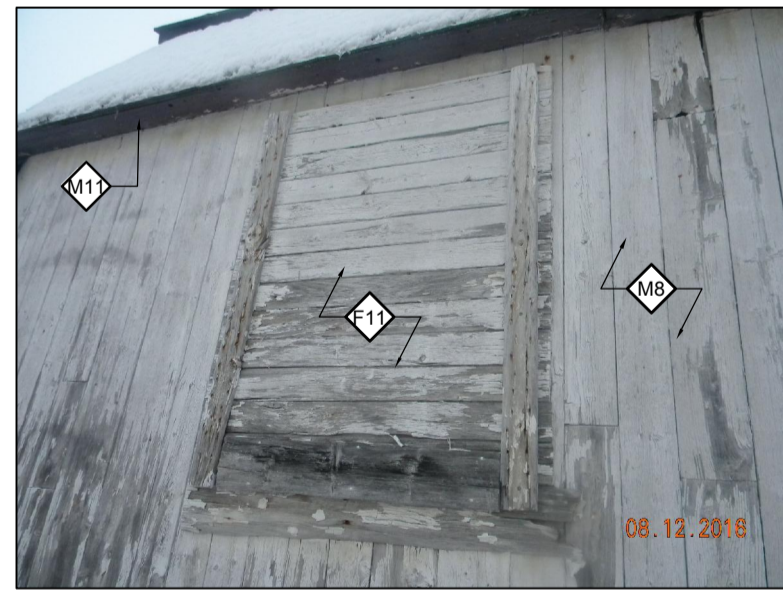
HORIZONTAL SIDING BOARD TO BE DEMOLISHED
